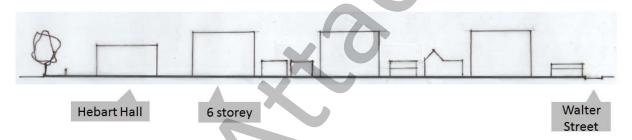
indicative east/west cross section looking north illustrating 3, 6 level buildings and looking northwards through space to low scale 2 storey buildings facing Archer Street.
